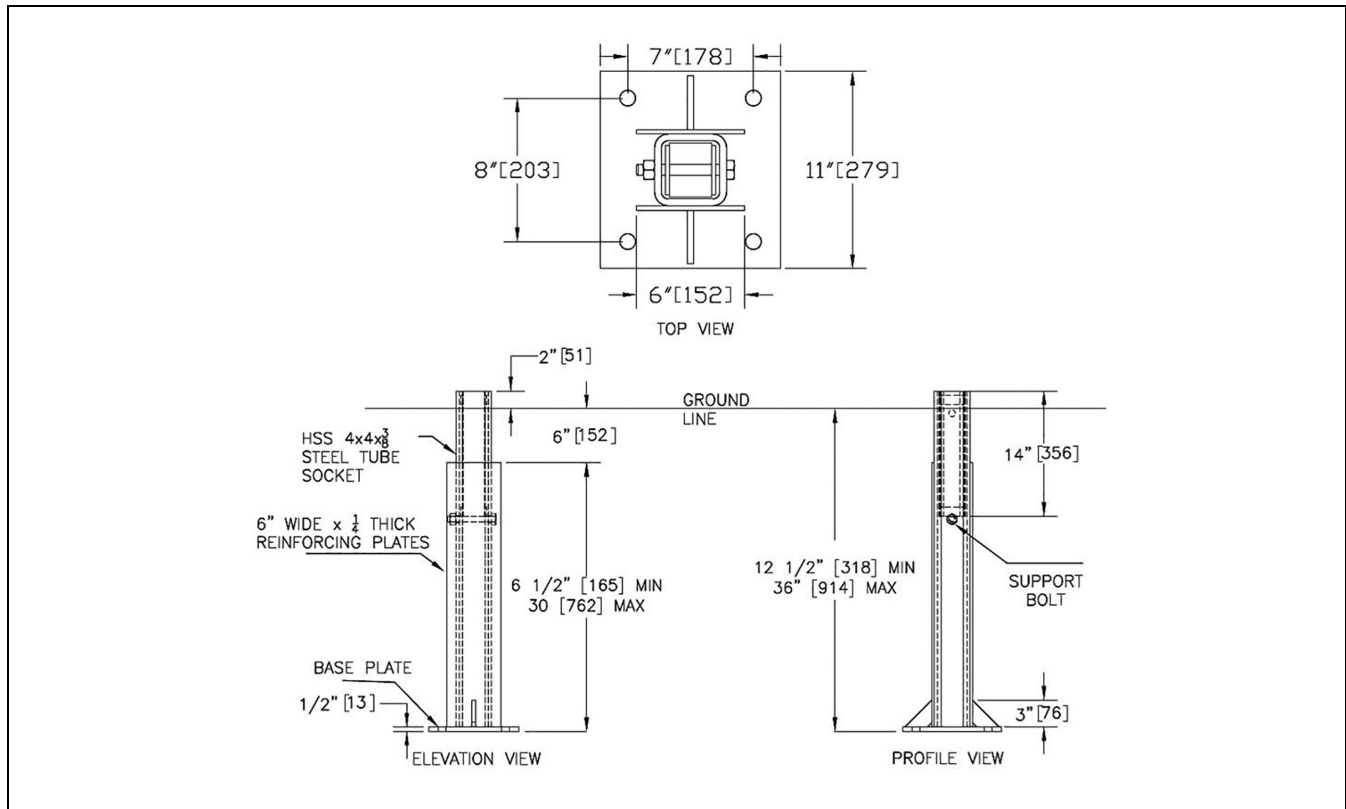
Steel socket assembly design concept for 1 ft and 3 ft soil fill depths.
